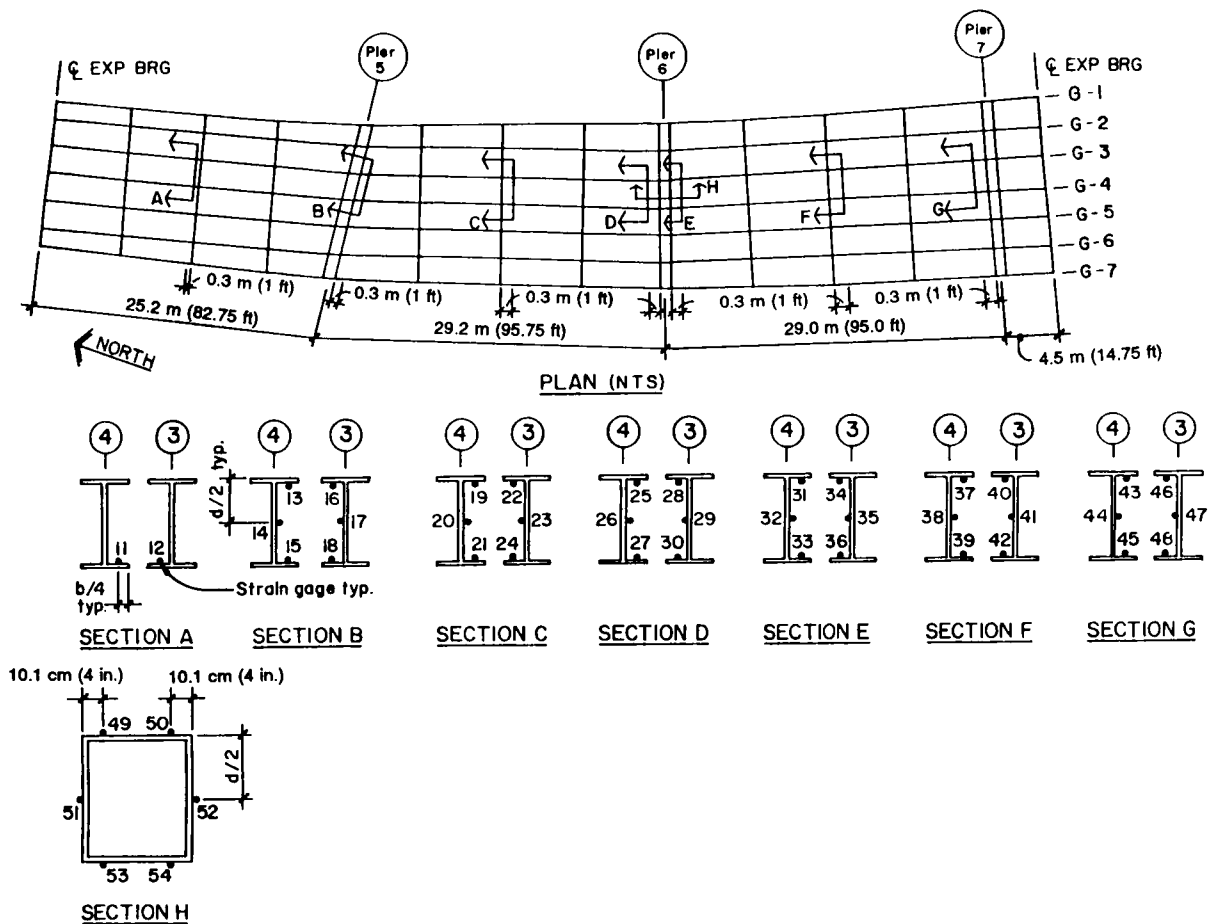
Strain gauge layout on longitudinal girders in northbound Spans 4-5 through 6-7.
